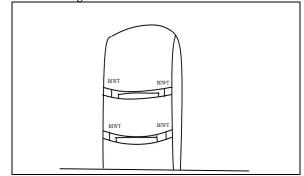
The schematic drawing of Pearl River Tower showing the BIWTs.
